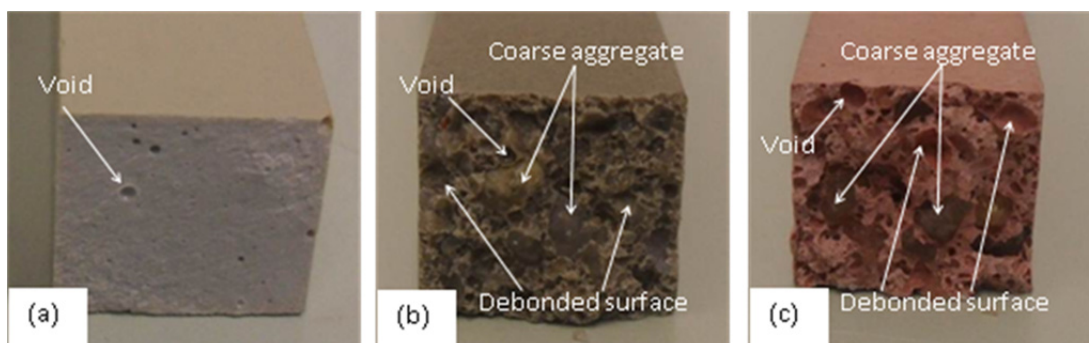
Typical failure surface of tensile specimens; (a) grout C, (b) grout D and (c) grout E
